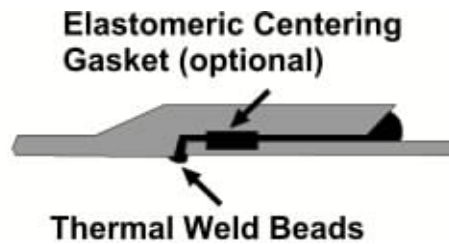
Bell & Spigot Pipe End Joining with Additional Weld Beads
